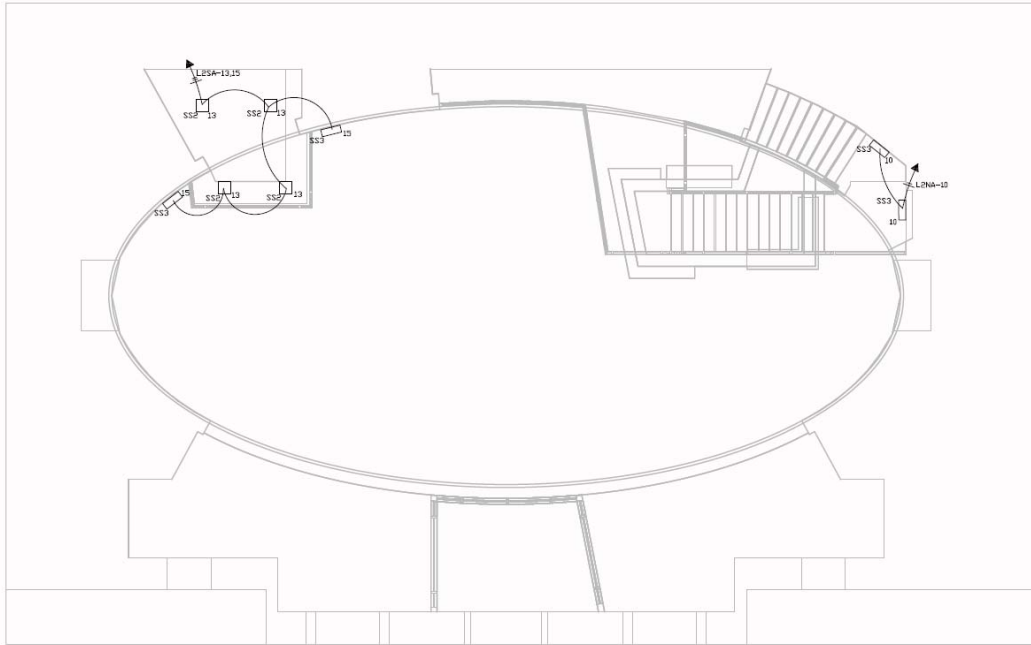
Second Floor Circuiting Plan – Atrium
